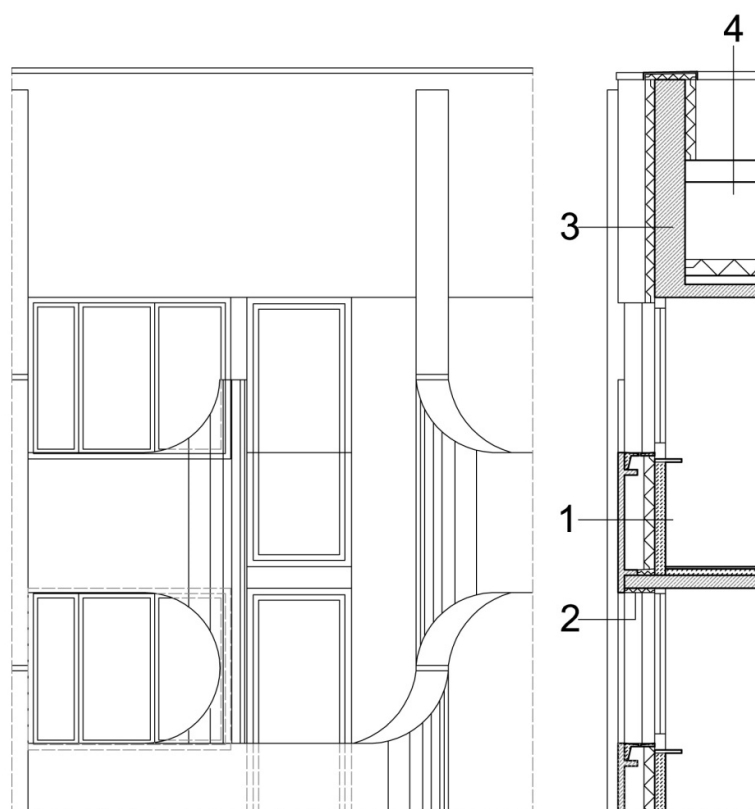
The façades of residential buildings at Grunwaldzki square—elevation and section. 1. The designed external wall (prefabricated): repaired and painted white prefabricates 6.0 cm, external void, mineral wool 8.0 cm, internal walls made of asbestos removed and replaced with light concrete blocks 12.0 cm, internal plaster 1.5 cm. 2. Insulation of loggias—mineral wool. 3. The designed external wall: silicone plaster 1.5 cm, mineral wool 8.0 cm, aerated concrete blocks or reinforced concrete wall 24.0 cm, internal plaster 1.5 cm (between windows). 4. The designed roof slab: 2x roofing felt, levelling layer 2.0 cm, slag concrete slabs in decline 8.0 cm, ventilation gap 5.0–30.0 cm, blown-in mineral wool granules in the air cavity 20.0 cm, prefabricated channel slabs 24.0 cm, internal plaster 1.5 cm (drawn by the Authors).
